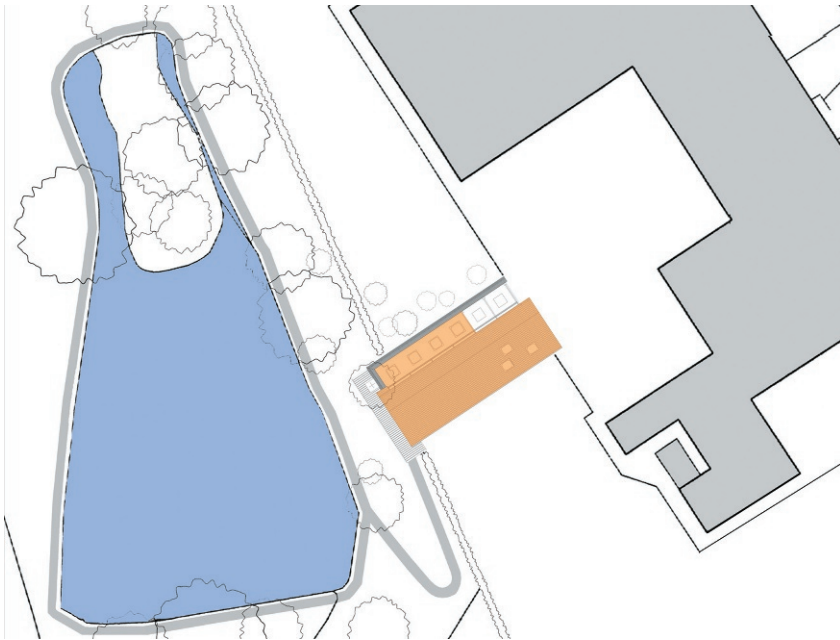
Site plan showing classroom adjacent to the pond and school. *Image owned by Sarah Wigglesworth Architects. Courtesy Sarah Wigglesworth Architects.
